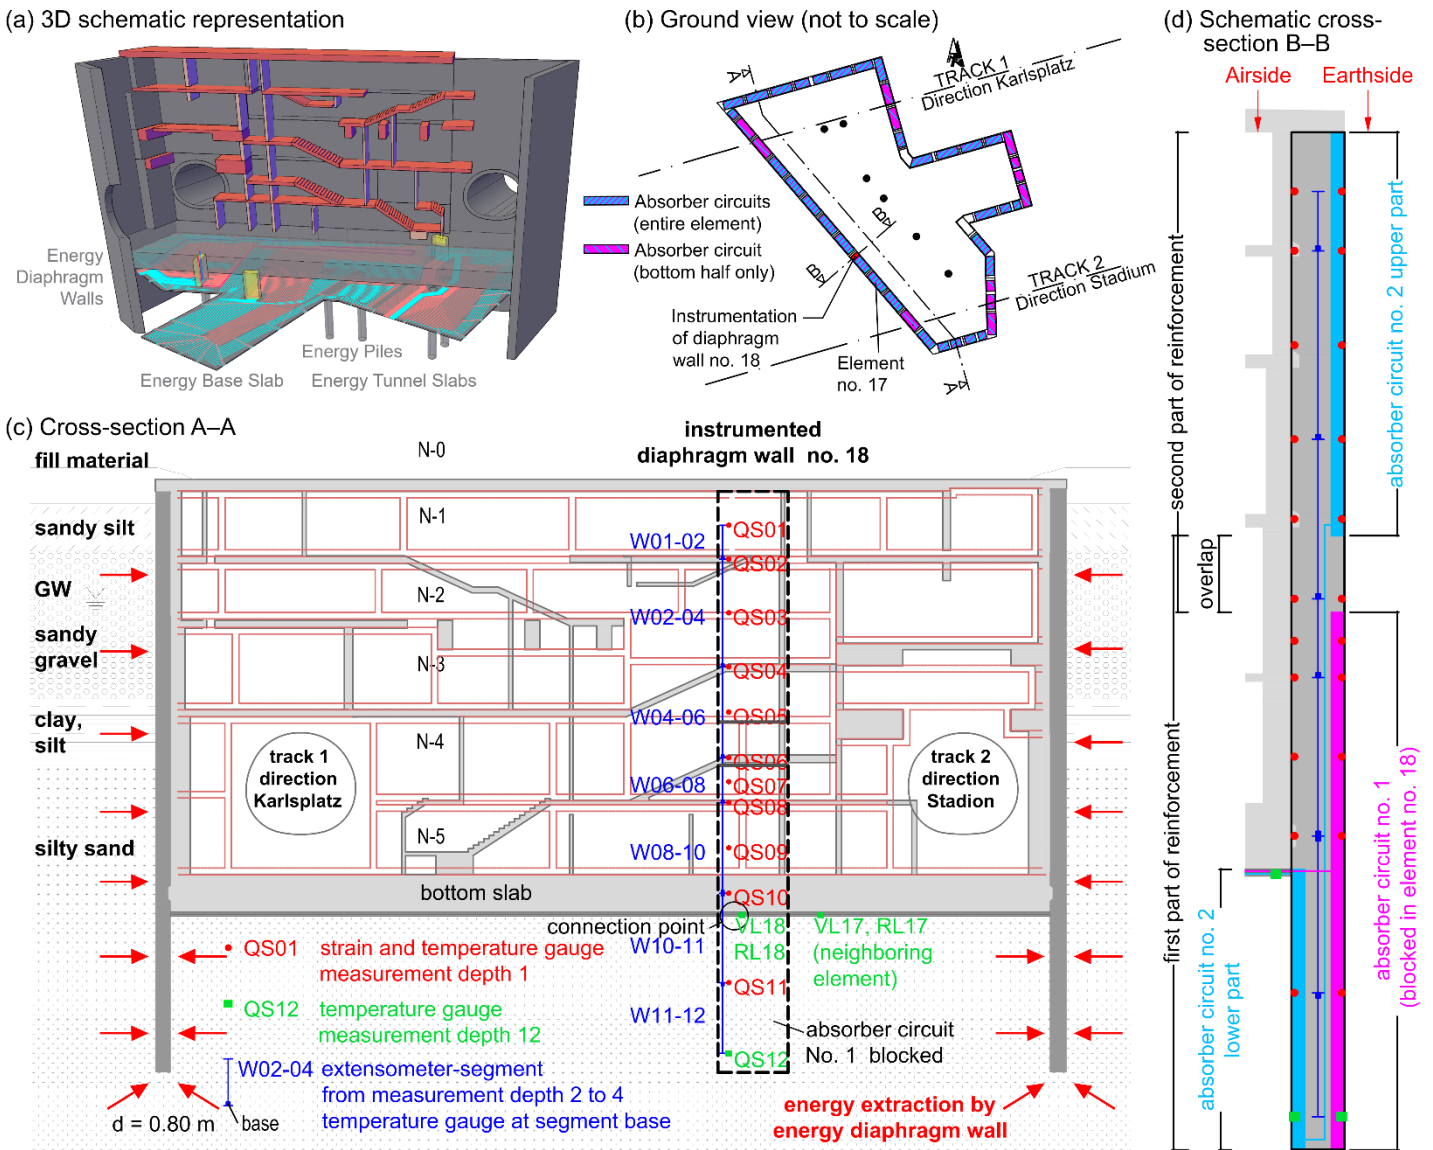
(a) 3D schematic representation of the thermally activated components; (b) Ground view of the metro station Taborstraße section T with position of instrumented diaphragm wall No. 18, neighboring element No. 17 and marked cross sections A-A and B-B; (c) Cross section A-A of U2 metro station Taborstraße section T with ground profile, position of instrumented diaphragm wall No. 18; (d) Schematic illustration of cross section B-B showing the installed heat exchanger circuit's positions (No. 18).
